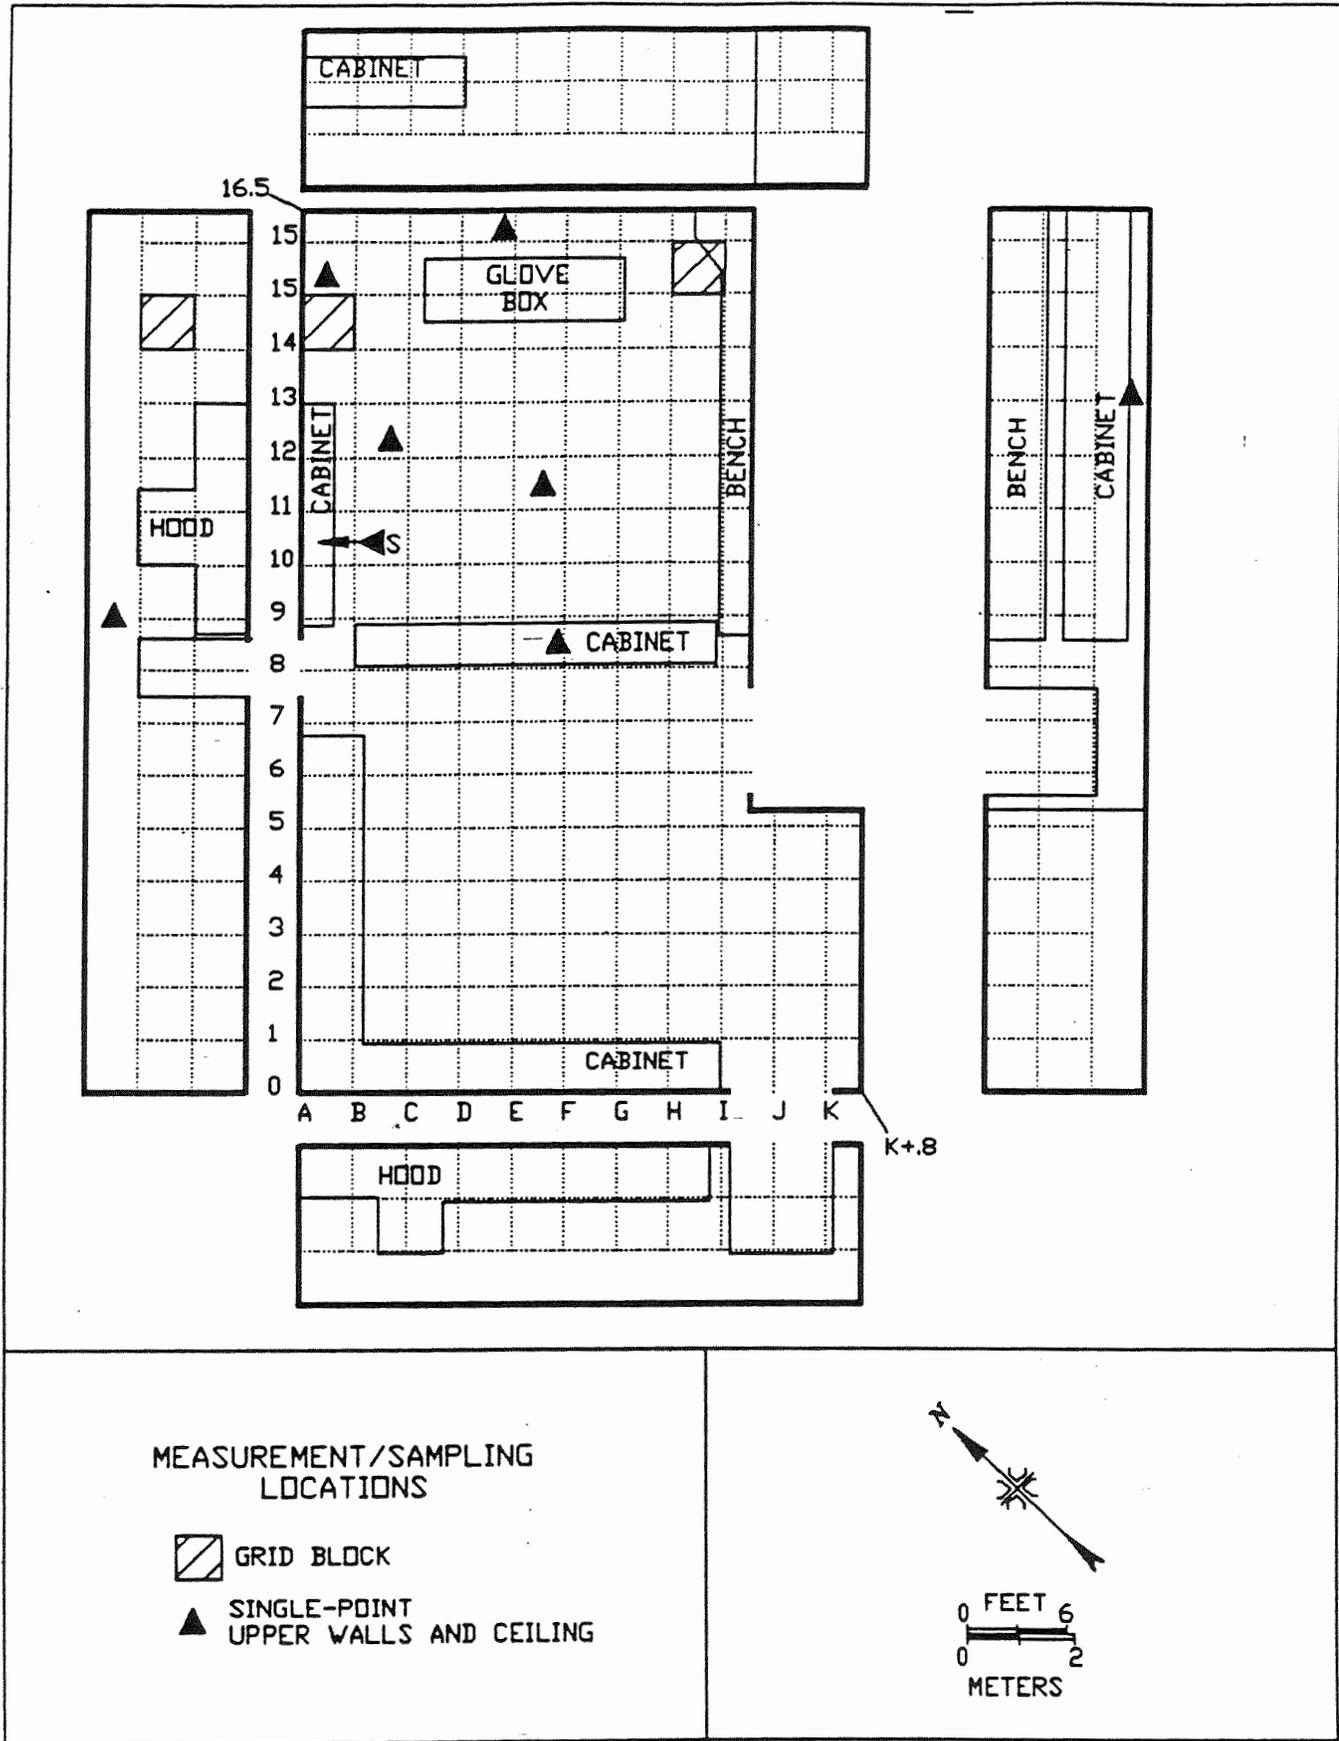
Building 023, Room 106 - Measurement and Sampling Locations
